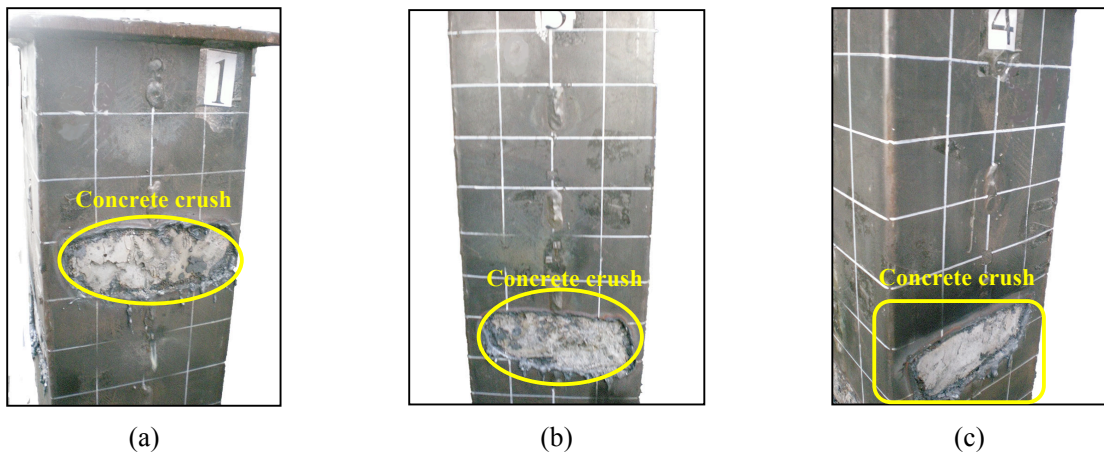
Concrete failure mode of the S9 specimen
